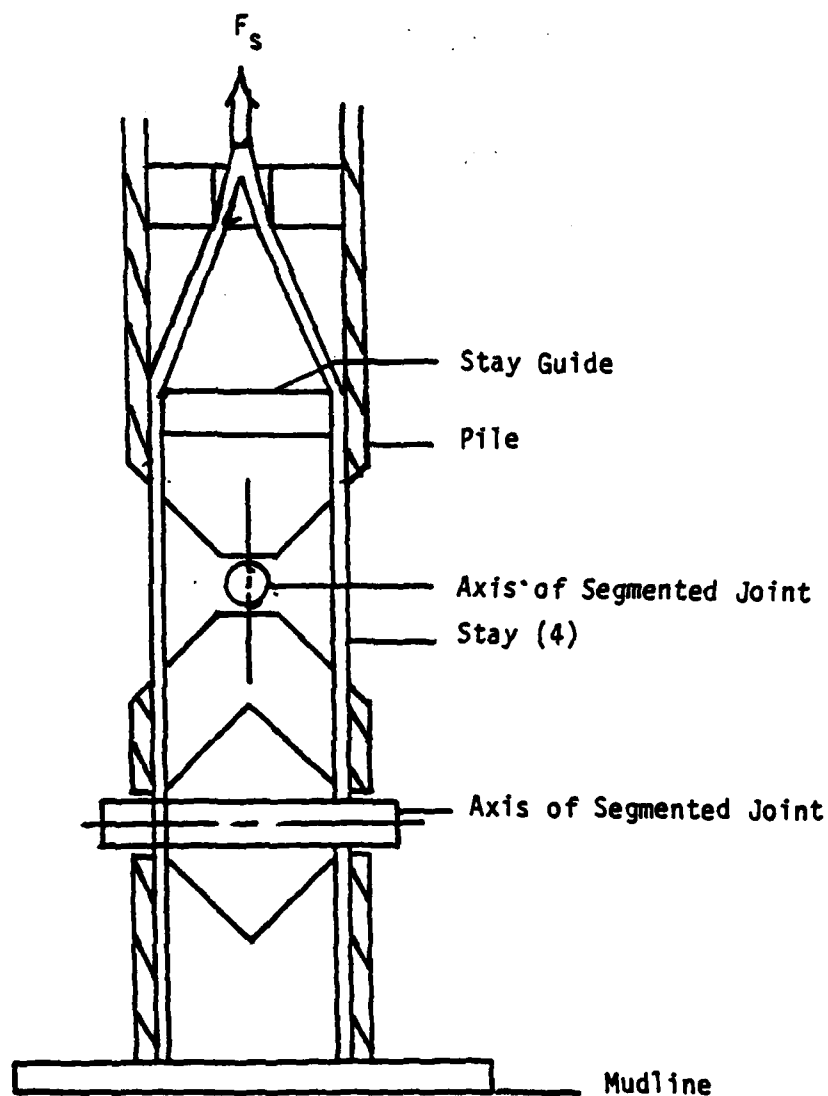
The segmented pile/internal stay concept. Four internal stays are guided to lead across the joint notches. The stays are prestressed by F_s .
